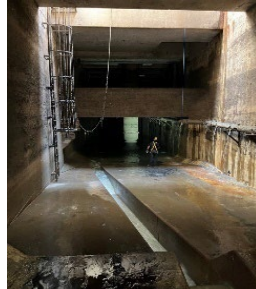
shows sidewalk replacement at the CON facility. Photo 3 shows work in progress at Oakwood in the influent area. Photo 4 shows work in progress at Hubbell-Southfield Facility.
